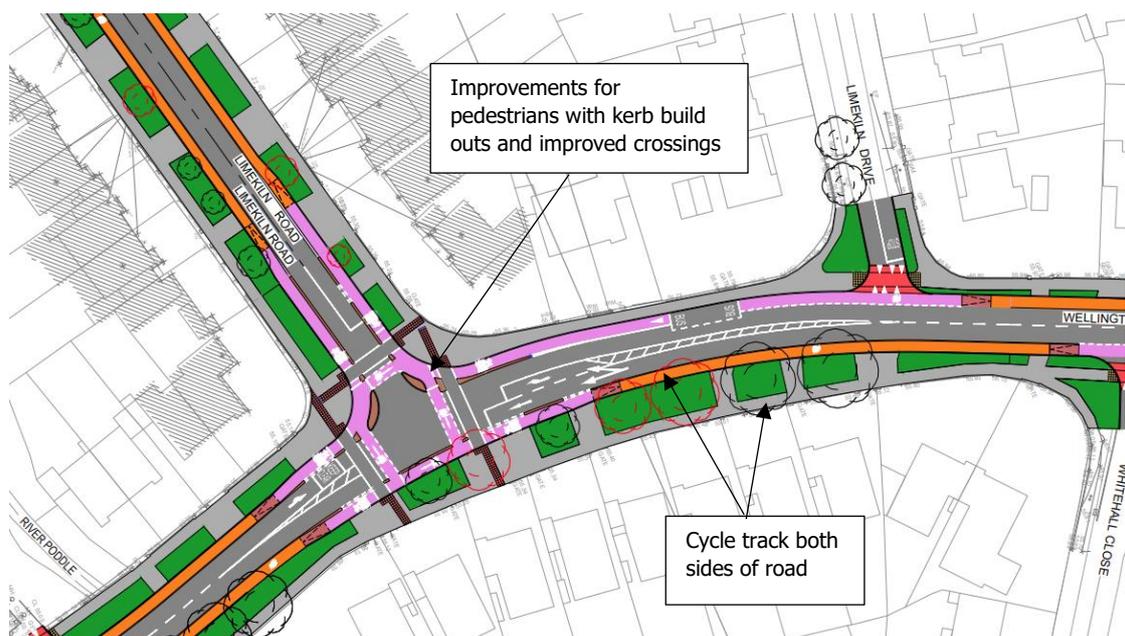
General design facilities between Orwell Roundabout and Templeville Junction
